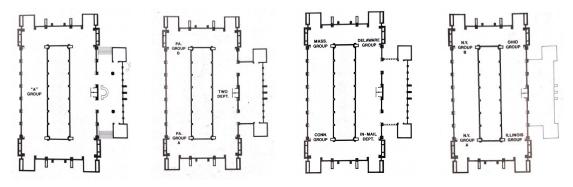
(left to right) Main to Fourth floor plan showing the rectangular approach by Wright for the Larkin Building
